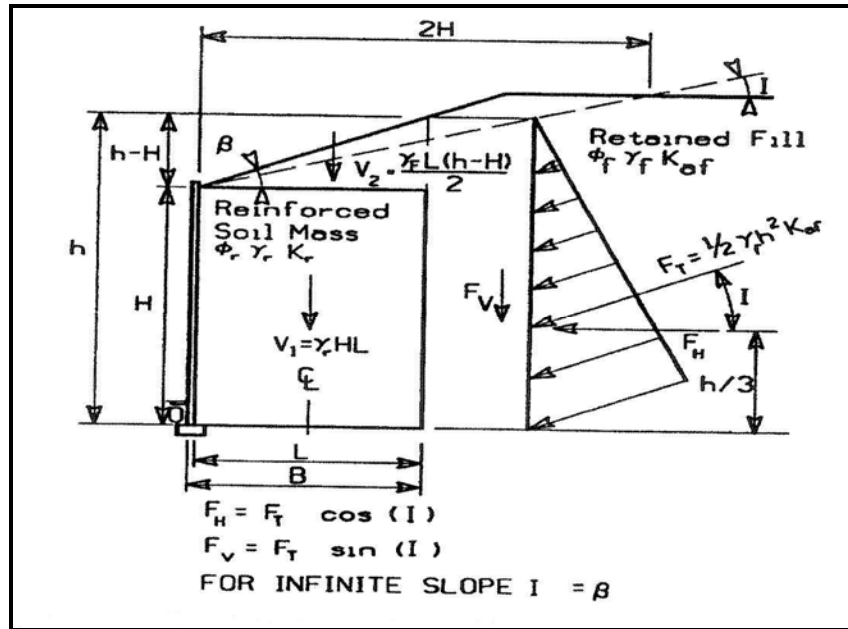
, MSE Wall Earth Pressure for Broken Backslope (Mechanically Stabilized Earth walls and Reinforced Soil Slopes Design & Construction Guidelines – March 2001)
